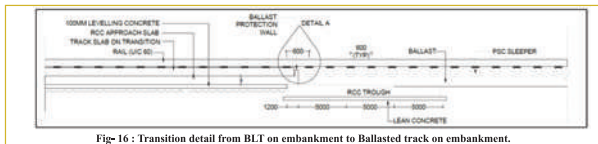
Transition detail from BLT on embankment to Ballasted track on embankment.
